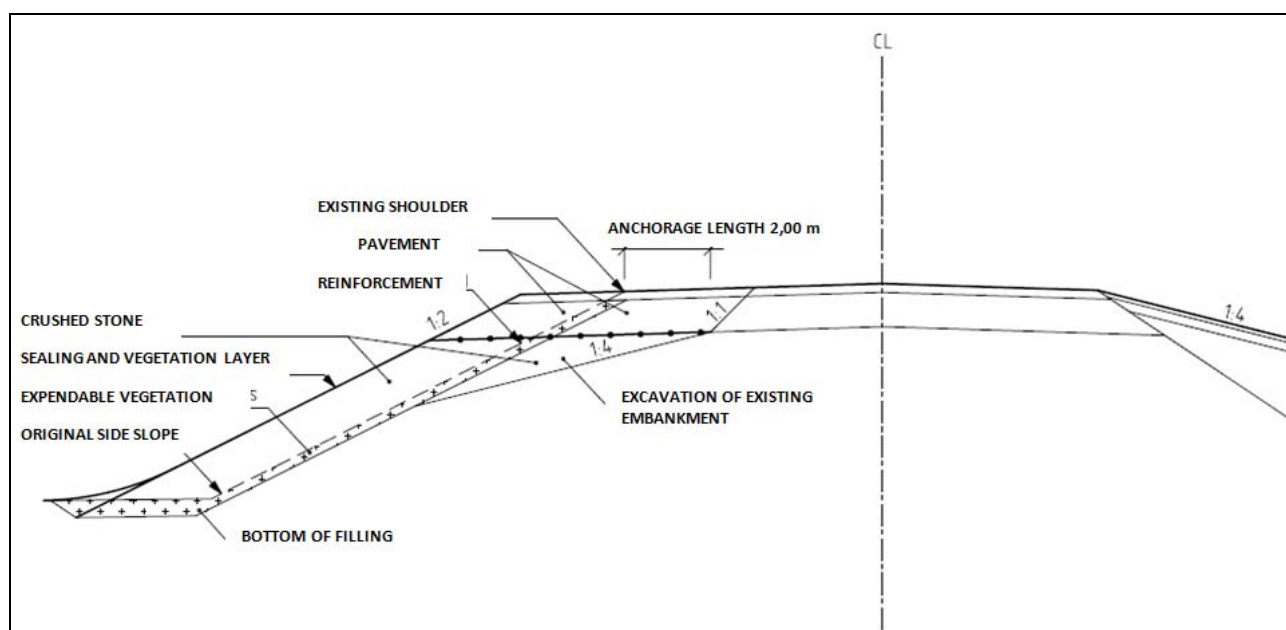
Preliminary drawing of a paved road widening [Modified from Norwegian Public Road Administration 2007]
